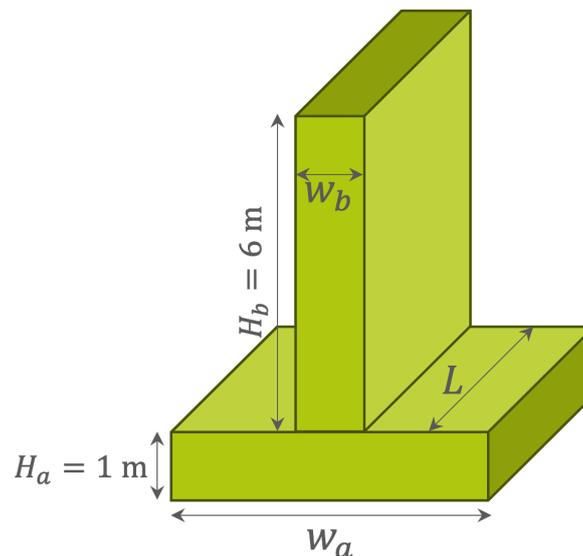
Masonry wall resting on a foundation (bearing stress problem).
